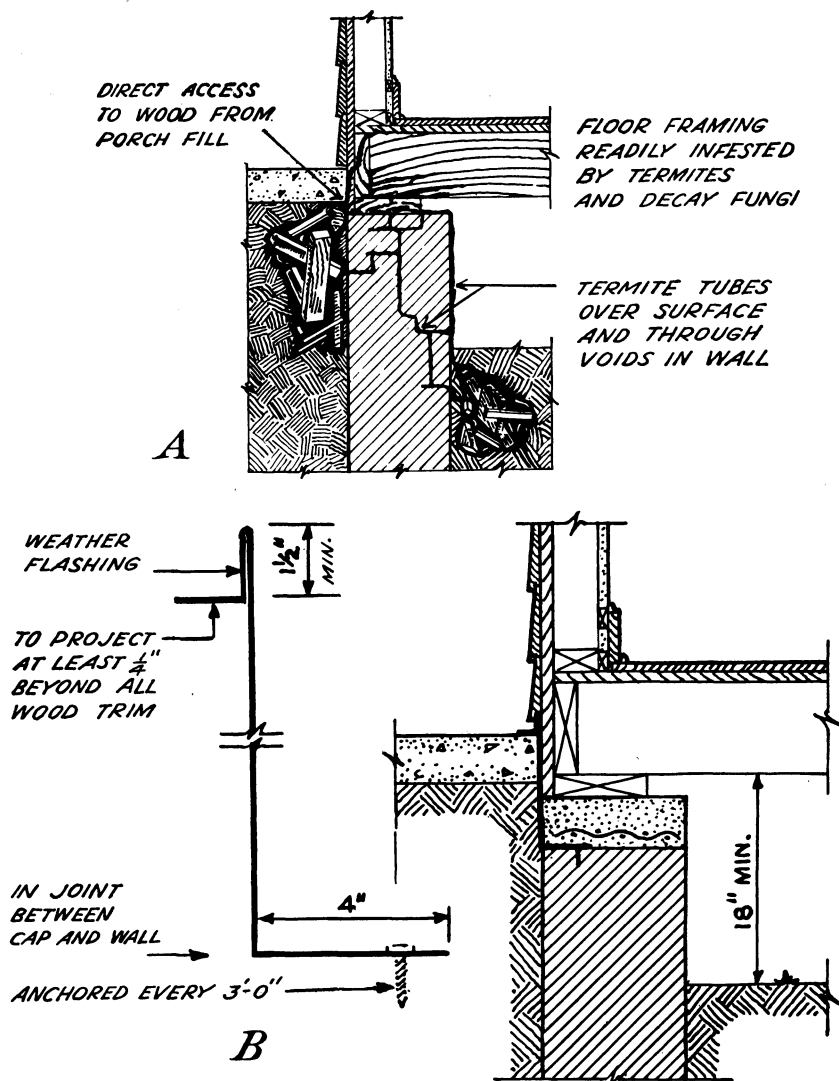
Dirt-filled porches: *A*, Bad practice—an infestation originating in debris may spread through hidden points of access from porch fill or up through voids or cracks in a unit-type wall. Infestations in the debris encourage the construction of shelter tubes on a wall in enclosed or partially excavated areas. The most destructive of the decay fungi also are likely to enter the house from soil contacts of the kind shown here. *B*, Good practice—metal apron inserted between concrete slab and woodwork, anchored to unit-type foundation, and capped with reinforced concrete. The apron serves as a weather flashing as well as a barrier against termites and decay. The flashing should be continued 3 inches beyond the slab at both ends of the porch. If a termite shield is installed over the whole foundation the flashing can be made continuous with it and placed over the wall instead of under a cap.
